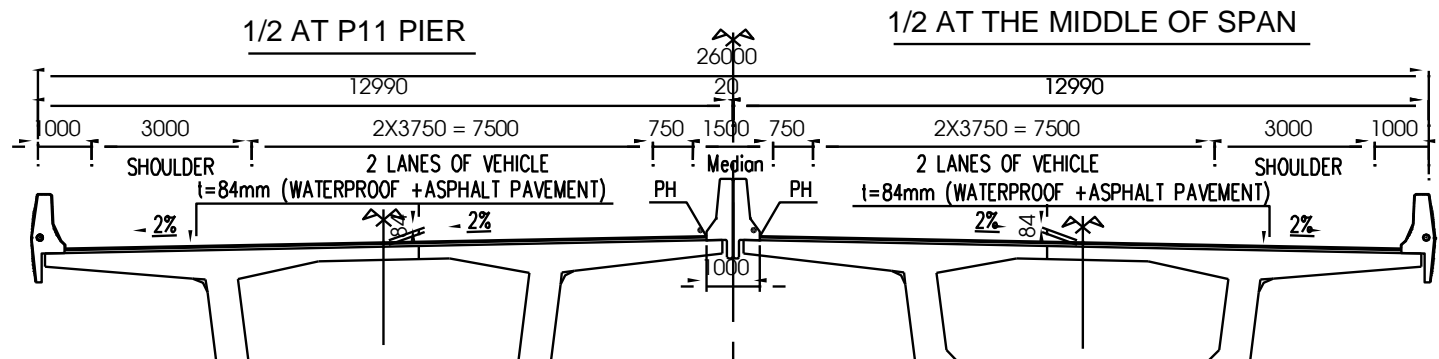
Typical Cross Section of Ky Lam Bridge (Initial Stage)
